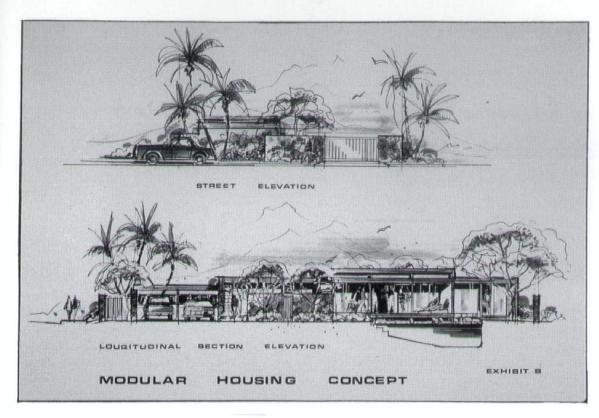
Exhibit B depicts the street and longitudinal elevations of the modular housing concept.
